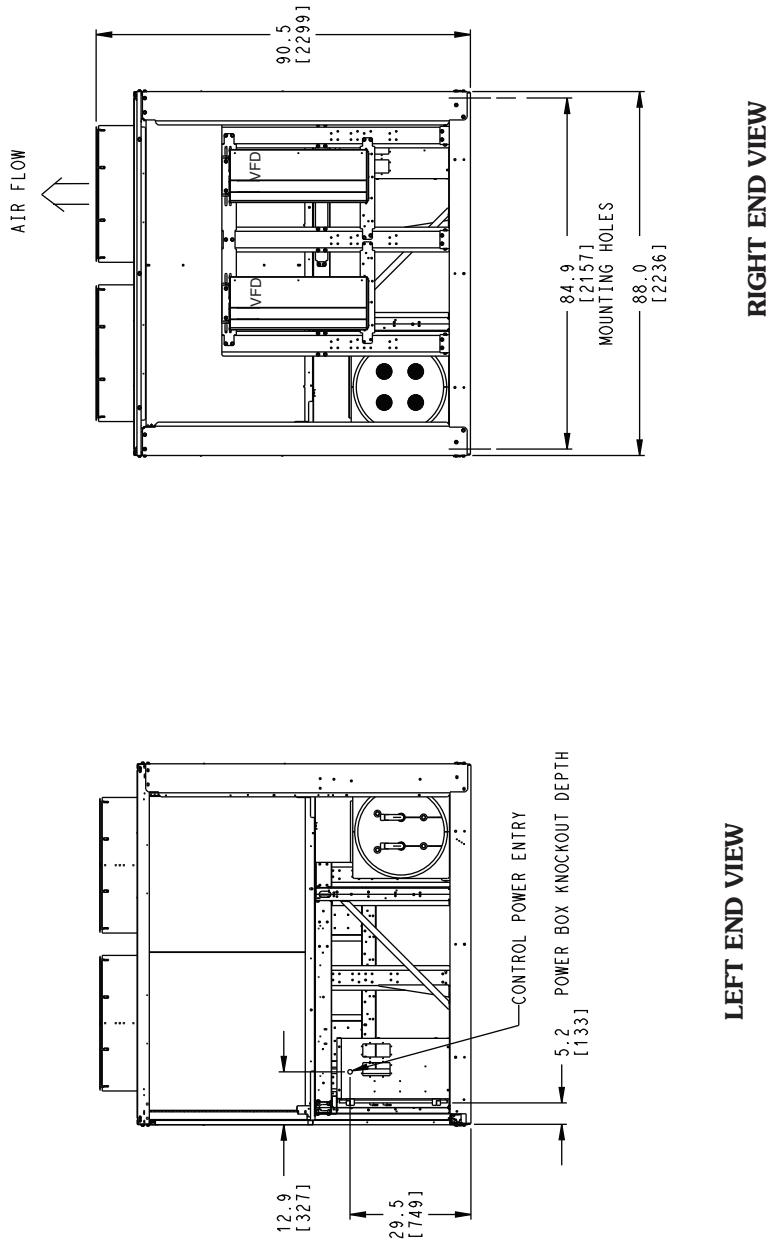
30XA222,242 Air-Cooled Liquid Chiller Dimensions (DX Cooler) (cont)
